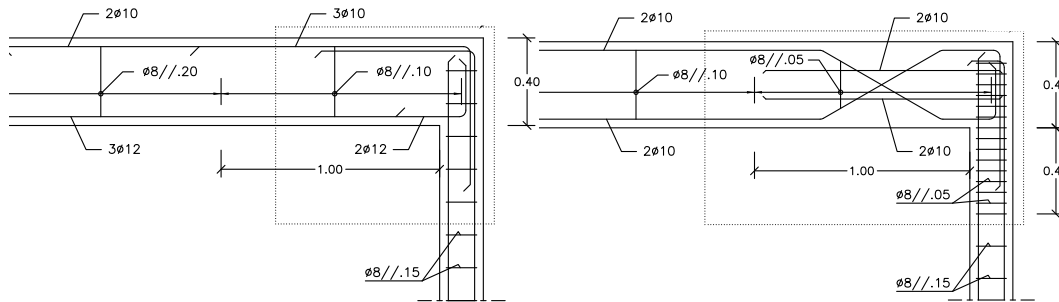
Beam/column joint reinforcement details of Structure 2 (left) and Structure 3 (right)
